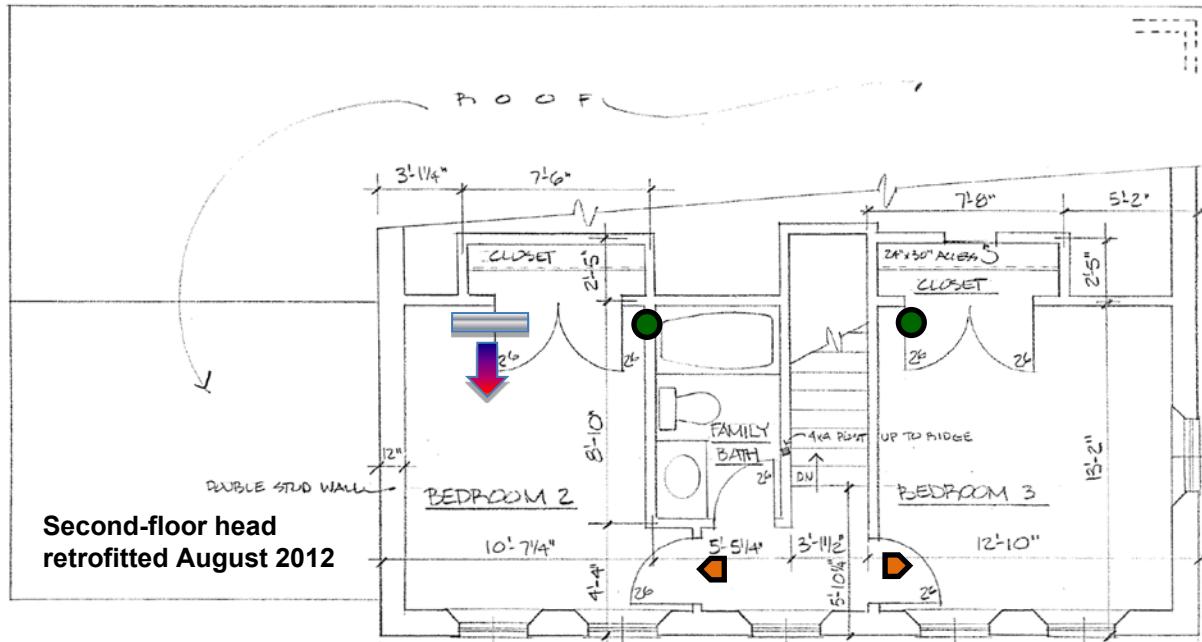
Easthampton Lot 17 second-floor plan, MSHP locations, monitoring locations
